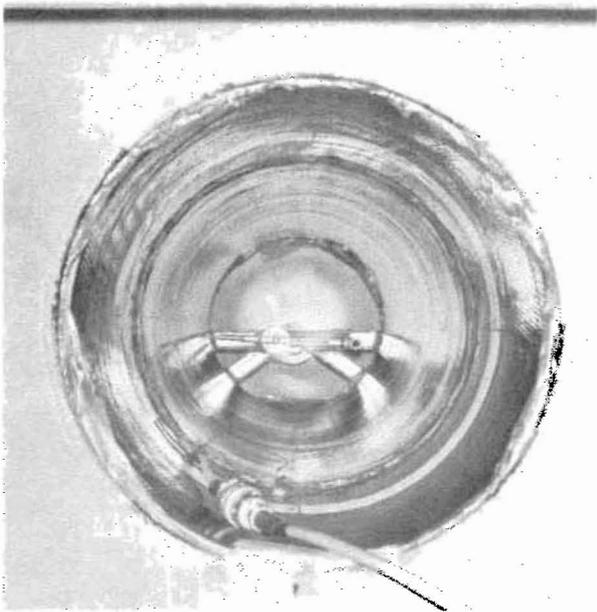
18-inch (46-cm) diameter FRP pipe in soil container prior to loading (Test G). Photo P801-D-73868
